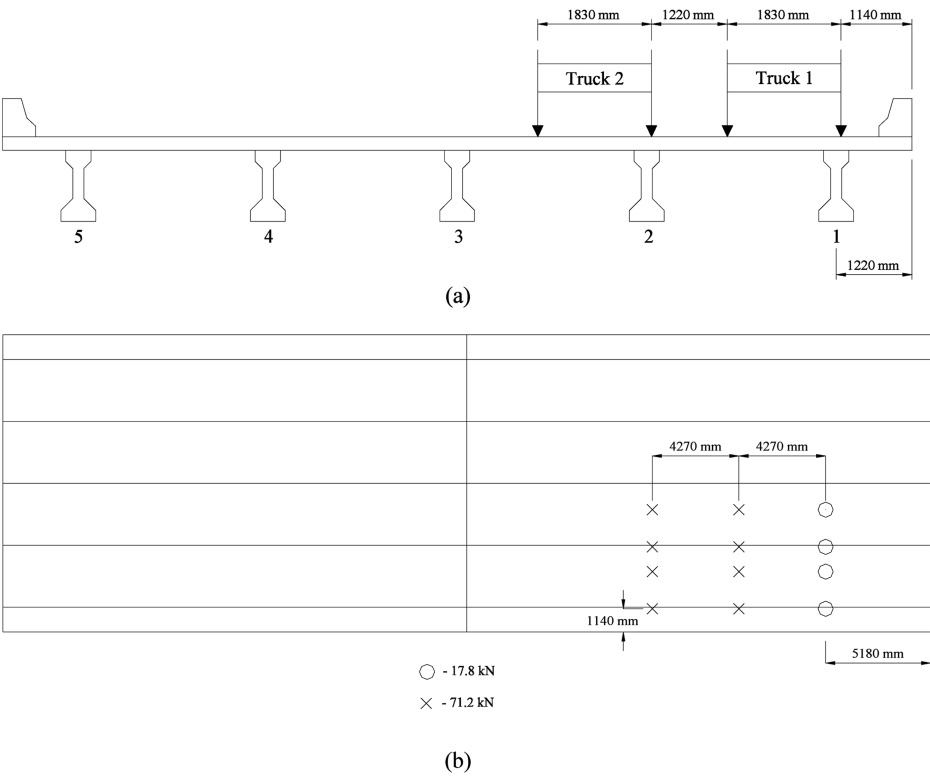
Loading position for non-skewed bridge (prestressed I-beam bridge): (a) transverse location and (b) longitudinal location
